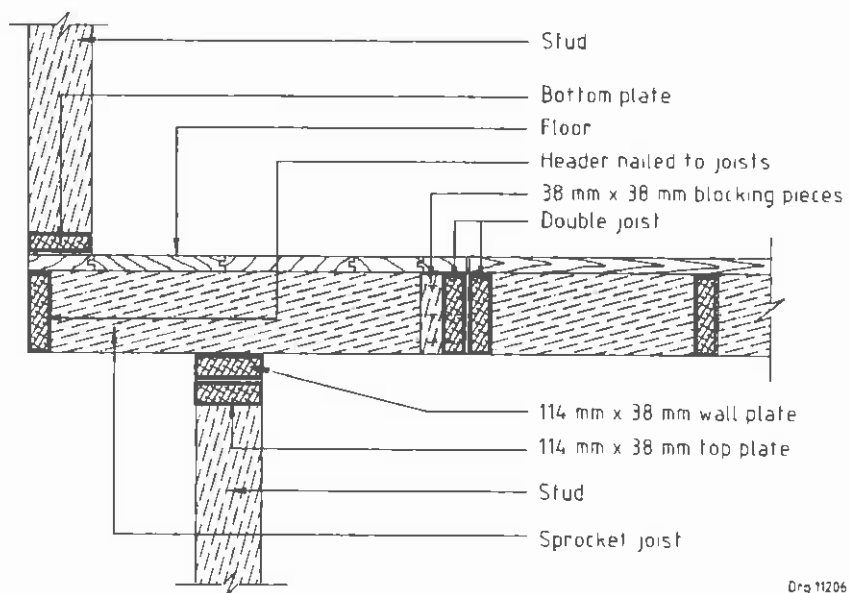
Overhang of external wall at first floor with joists parallel to wall below
